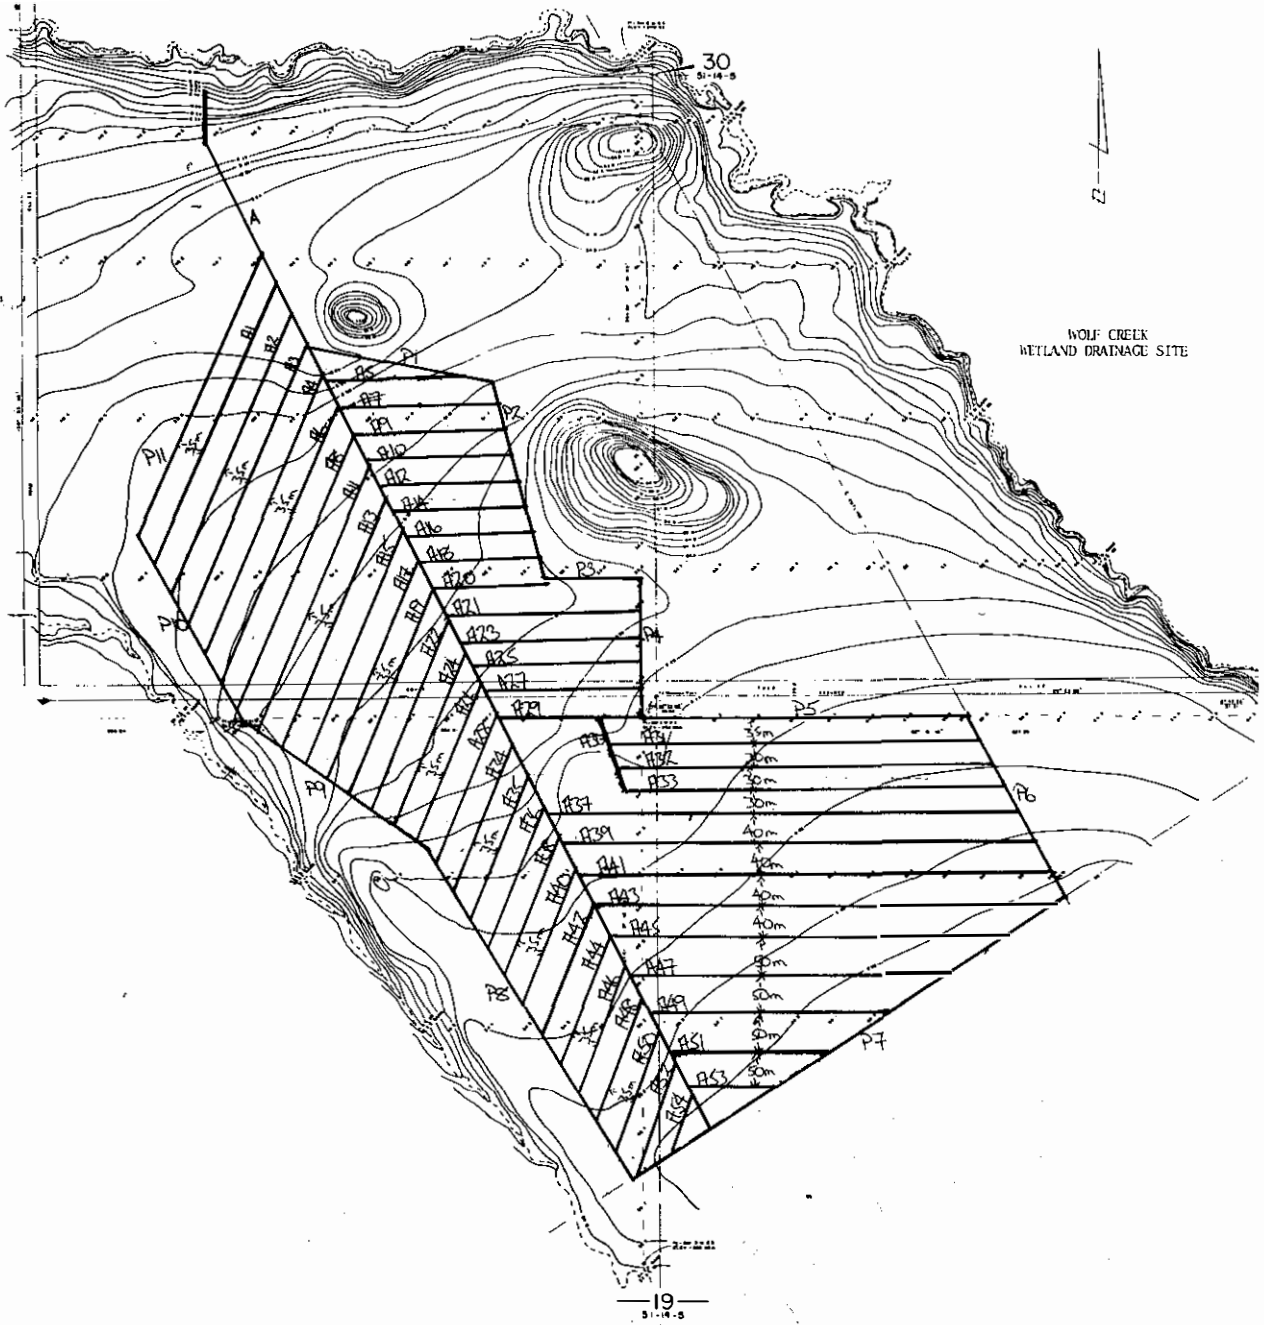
Drainage plan for Wolf Creek. Scale 1:9900.
